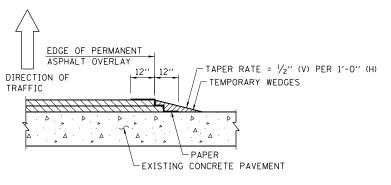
DETAIL OF BUTT JOINT, TYPE 2 AT EXISTING OVERLAY AREAS
